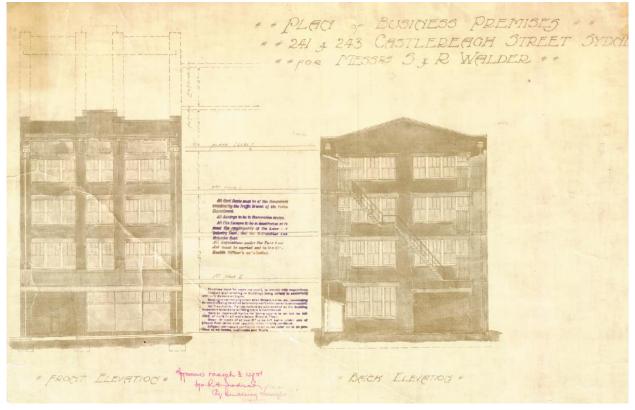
1920 architectural plans of 241-243 Castlereagh Street
